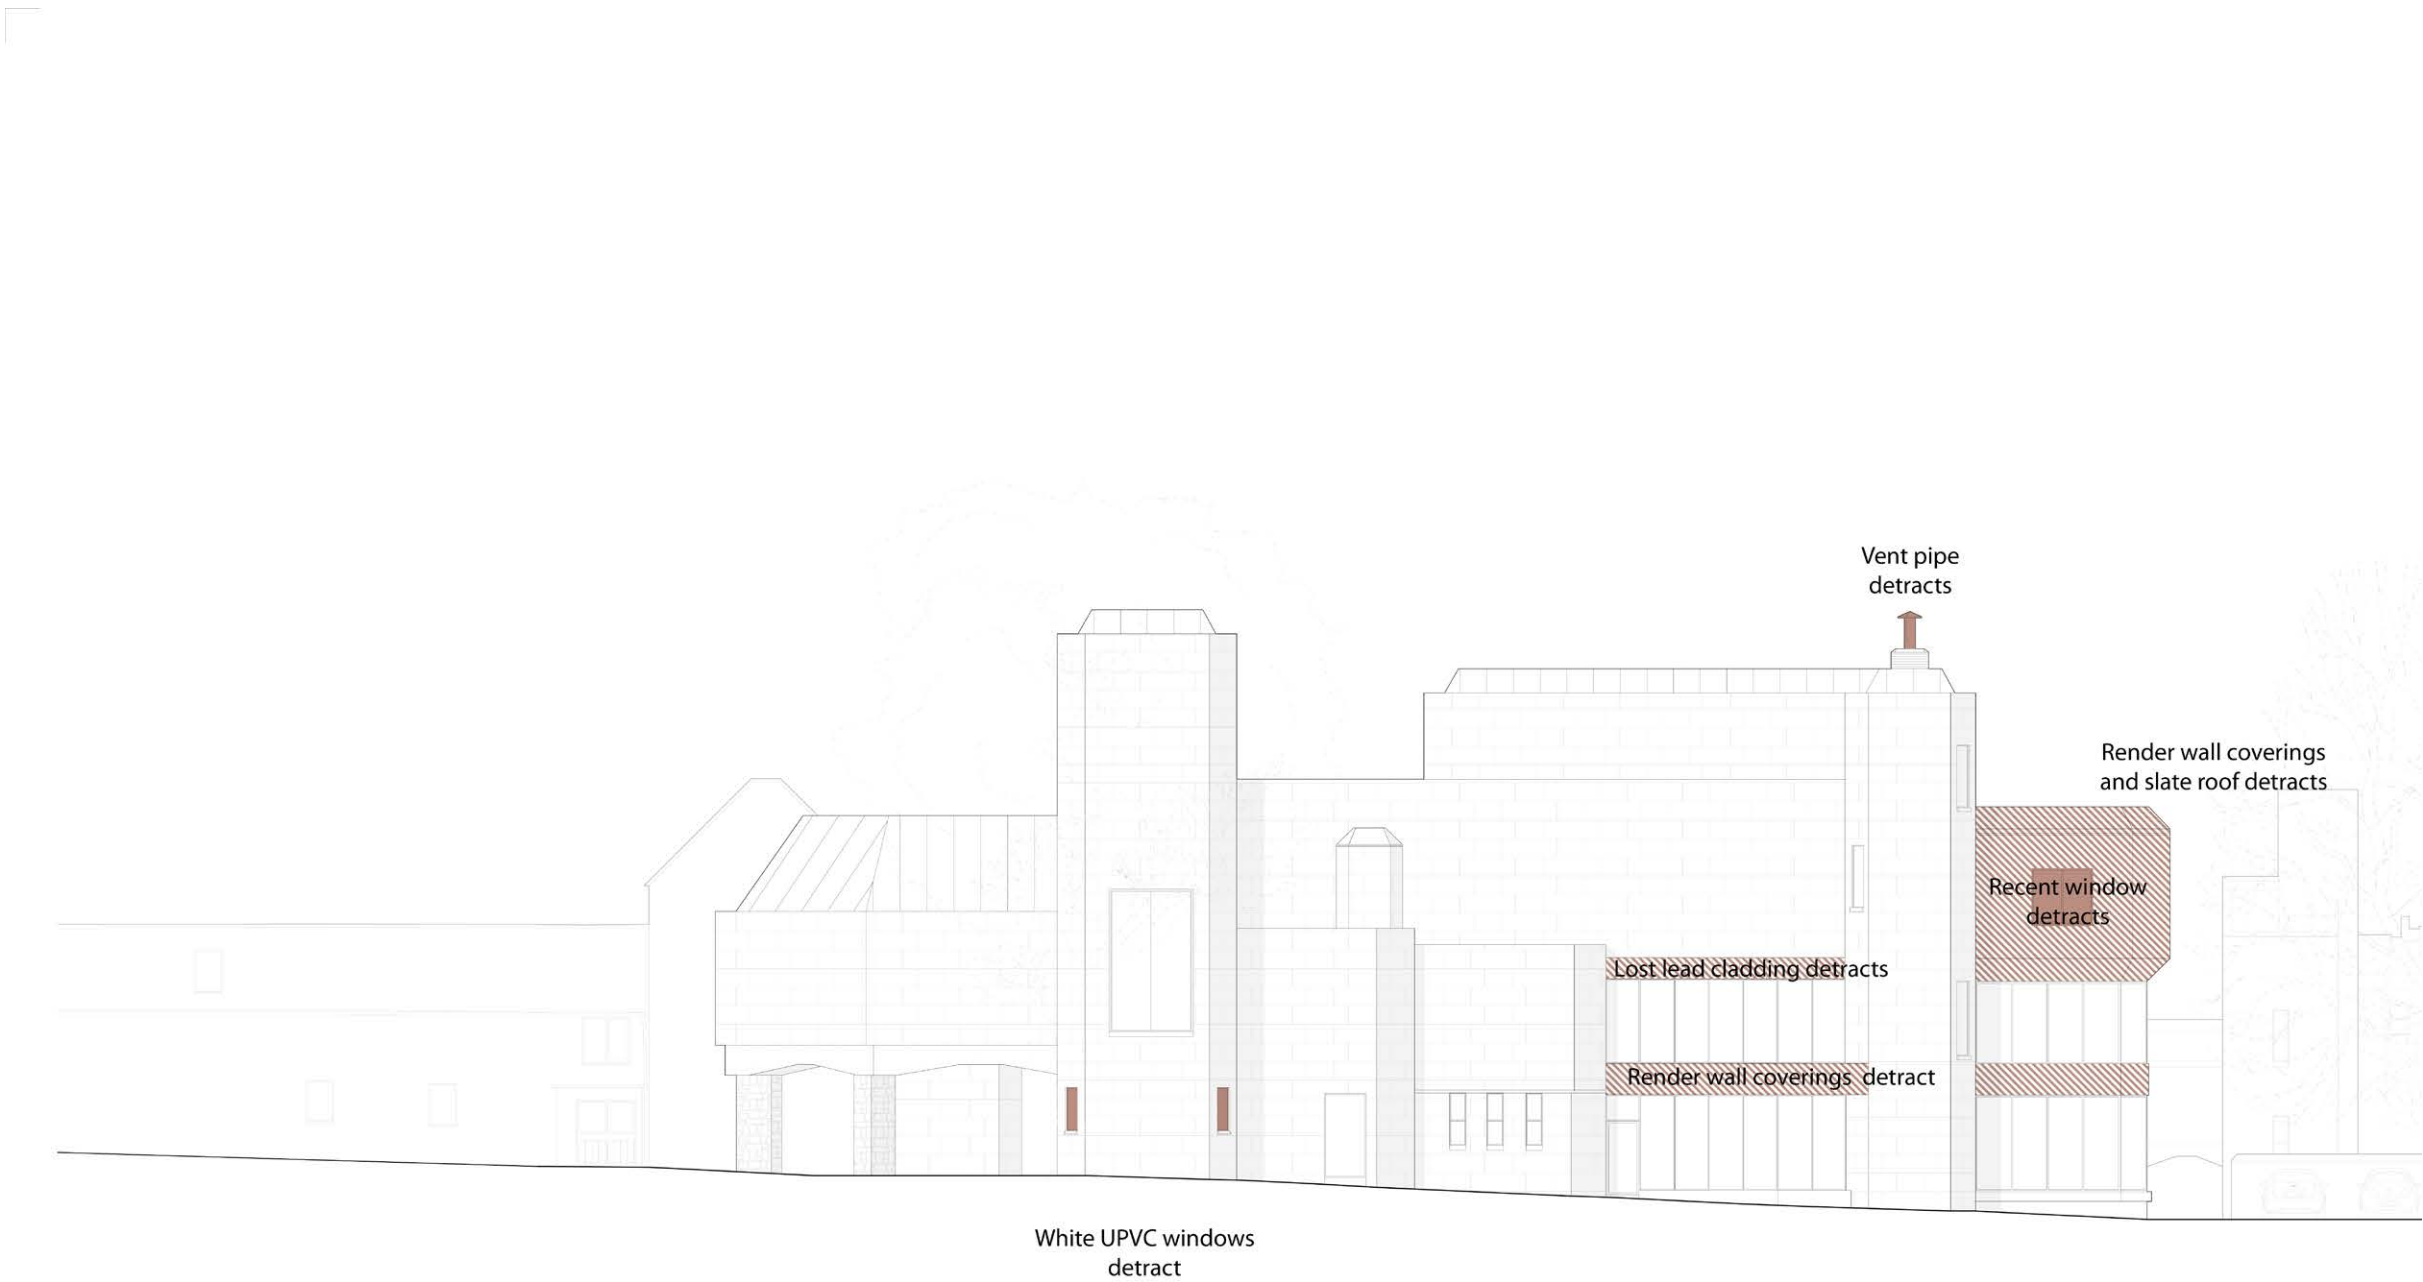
Rear (east) elevation detracting fabric [Ian Chalk Architects]
